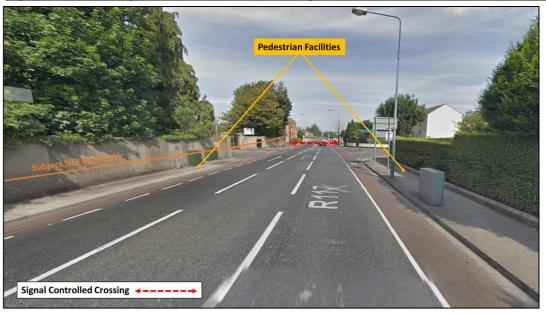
Existing Pedestrian Facilities along Sandford Road
